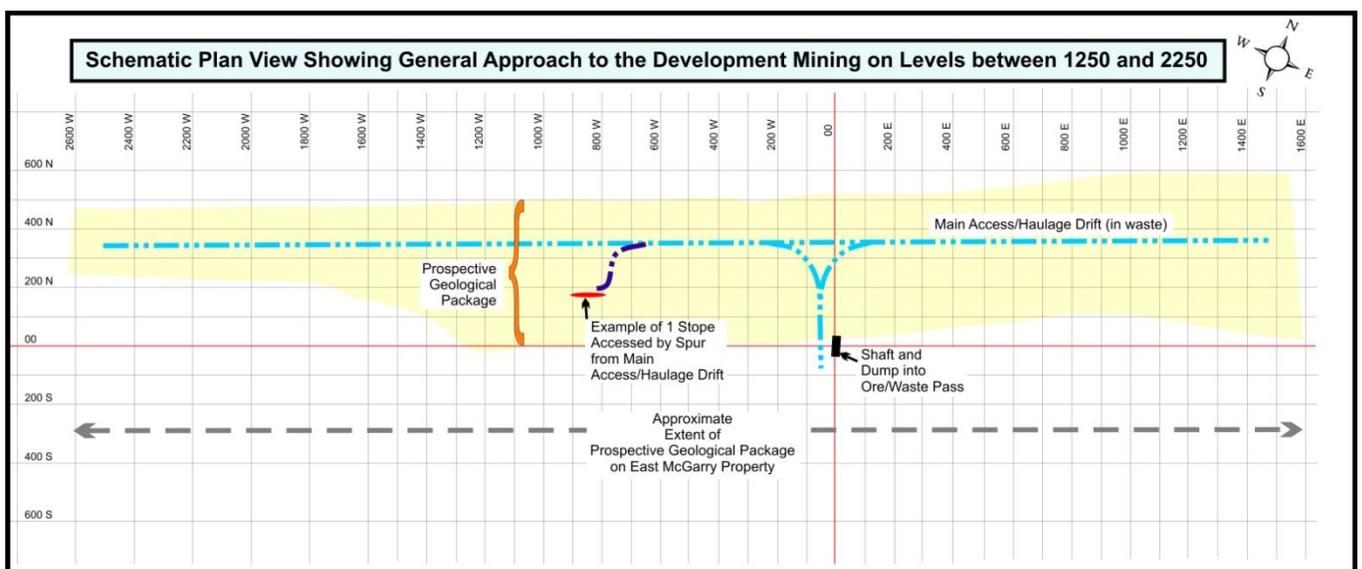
Schematic Plan Showing Strategic Approach to Development Mining – Upper Levels
